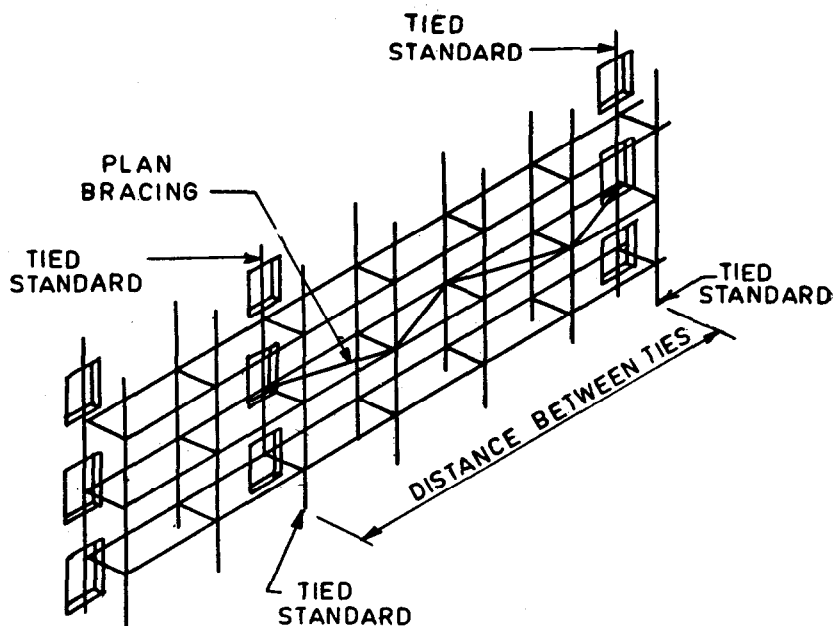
PLAN BRACING — USED WHEN HORIZONTAL DISTANCE BETWEEN TIES IS EXCESSIVE
